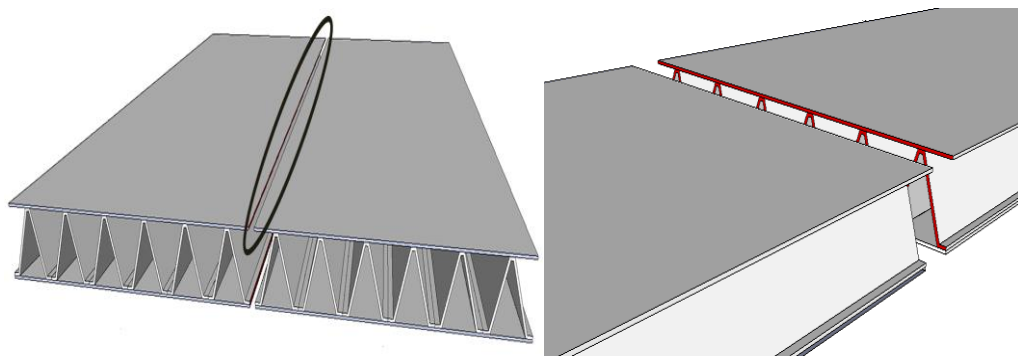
Panel to panel connection in the longitudinal (left) and transversal direction (right) of a SSP.
